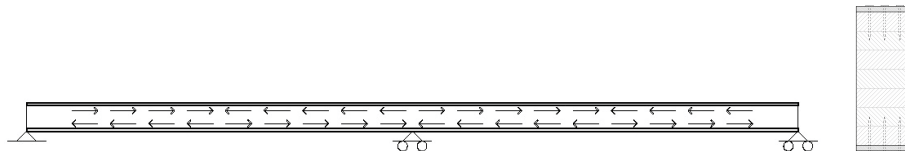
Example of a composite timber-steel beam with nailed steel plates.
